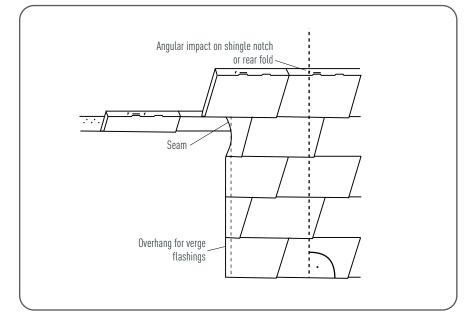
• Design details roof step- Roof shingle and DS.19 shingle
